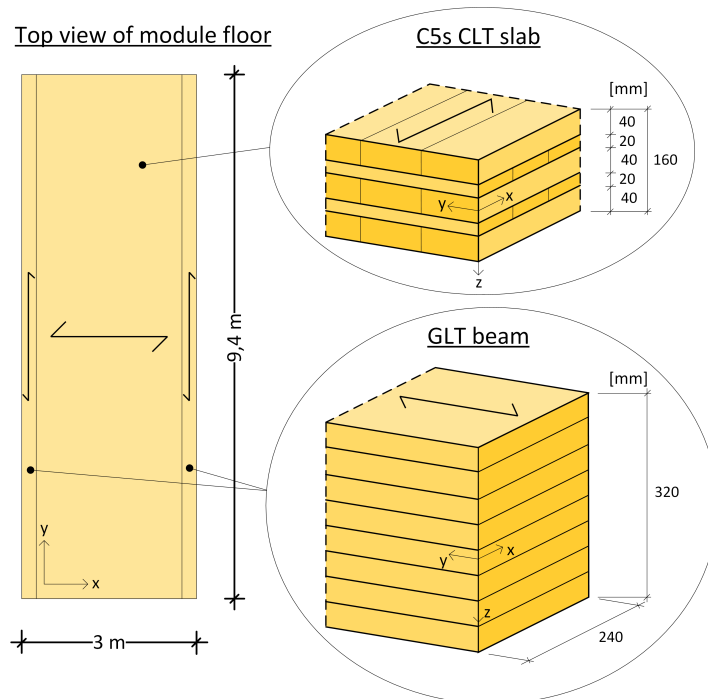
Top view of module floor with layouts of the CLT panel and GLT beam
